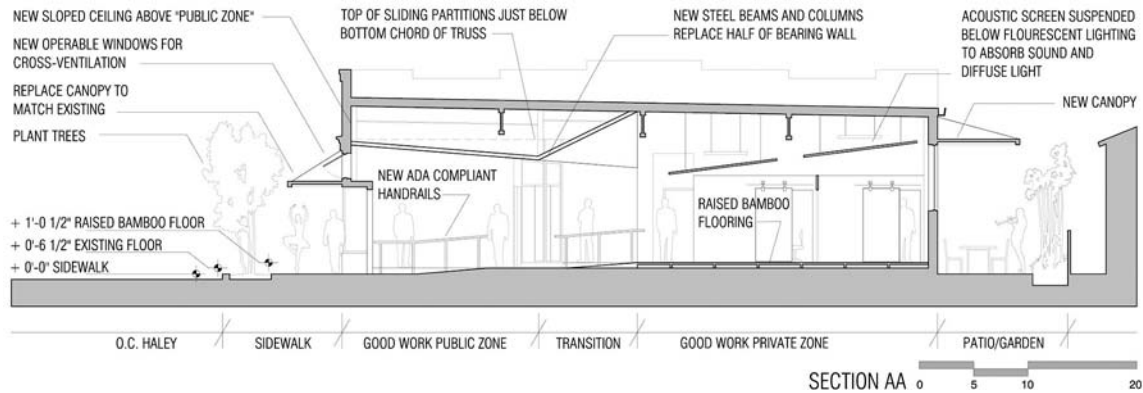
Sectional perspective rendering through GWN portion of renovated Franz Building.
